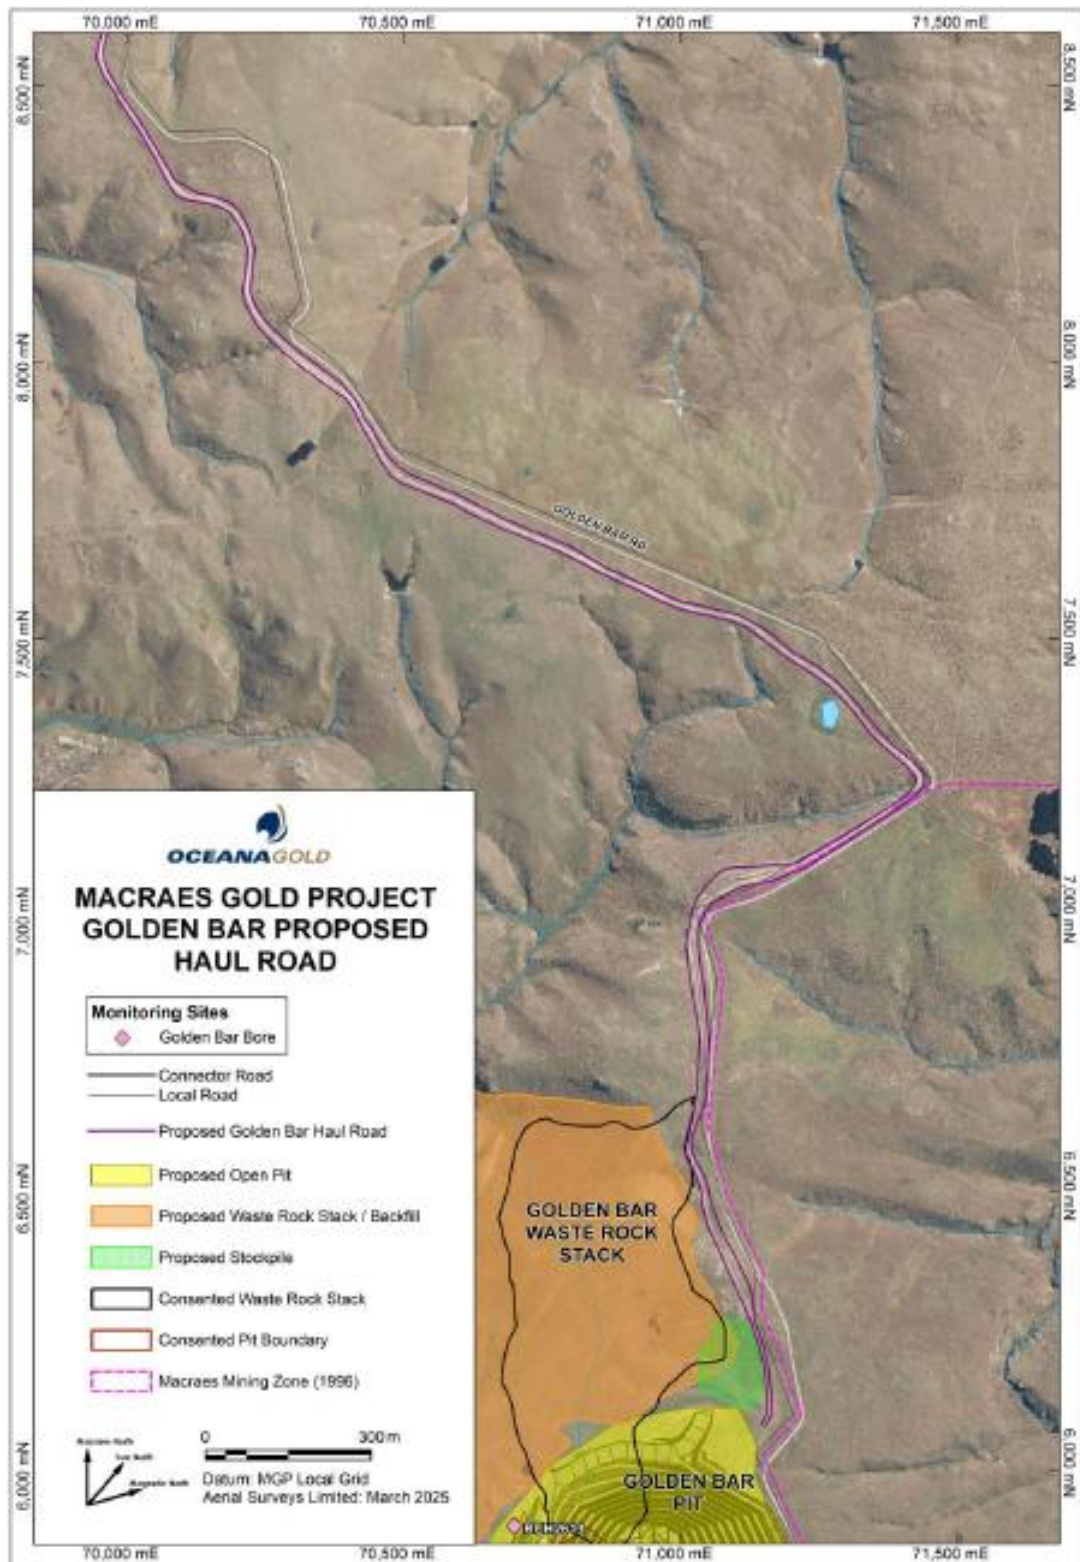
Proposed Golden Bar Haul Road Southern Extent.
